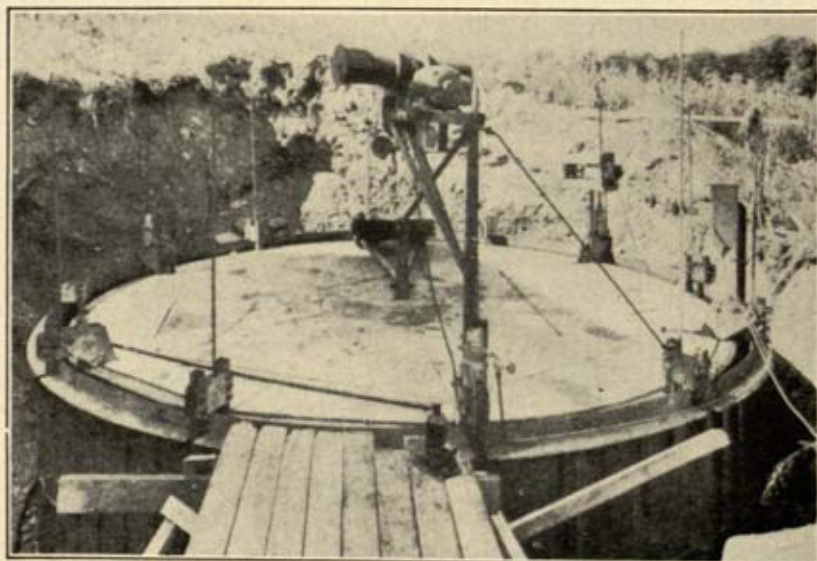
Hydraulic jacks installed to lift slip forms. (B. M. Heede, Inc.)
